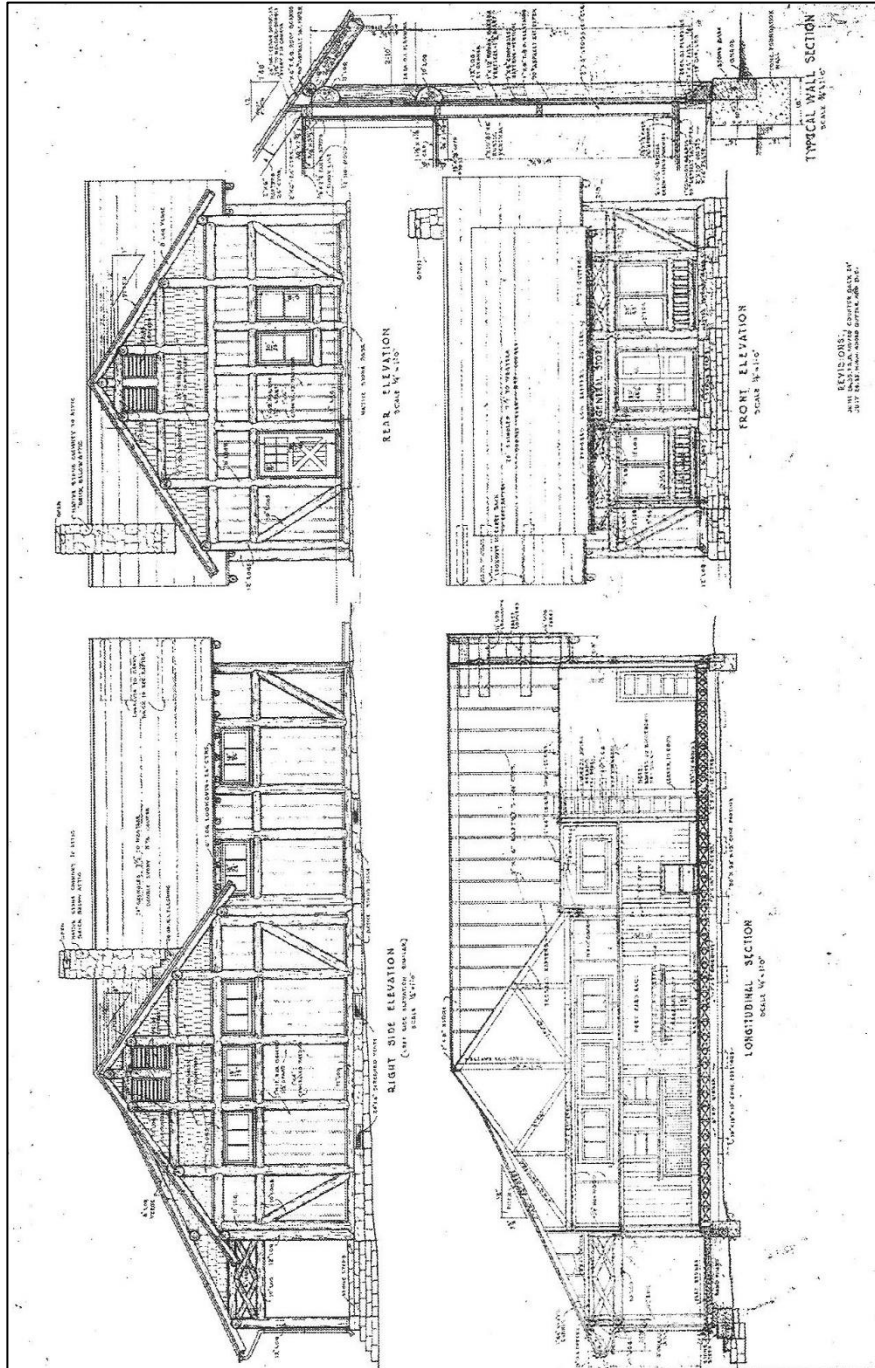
The 1935 architectural drawings for the general store were prepared by Great Northern architect Thomas McMahon. Its original craftsman-style look was obscured after an addition was built and the whole structure was covered with lapboard siding in the 1950s. (Technical Information Center drawing.)
